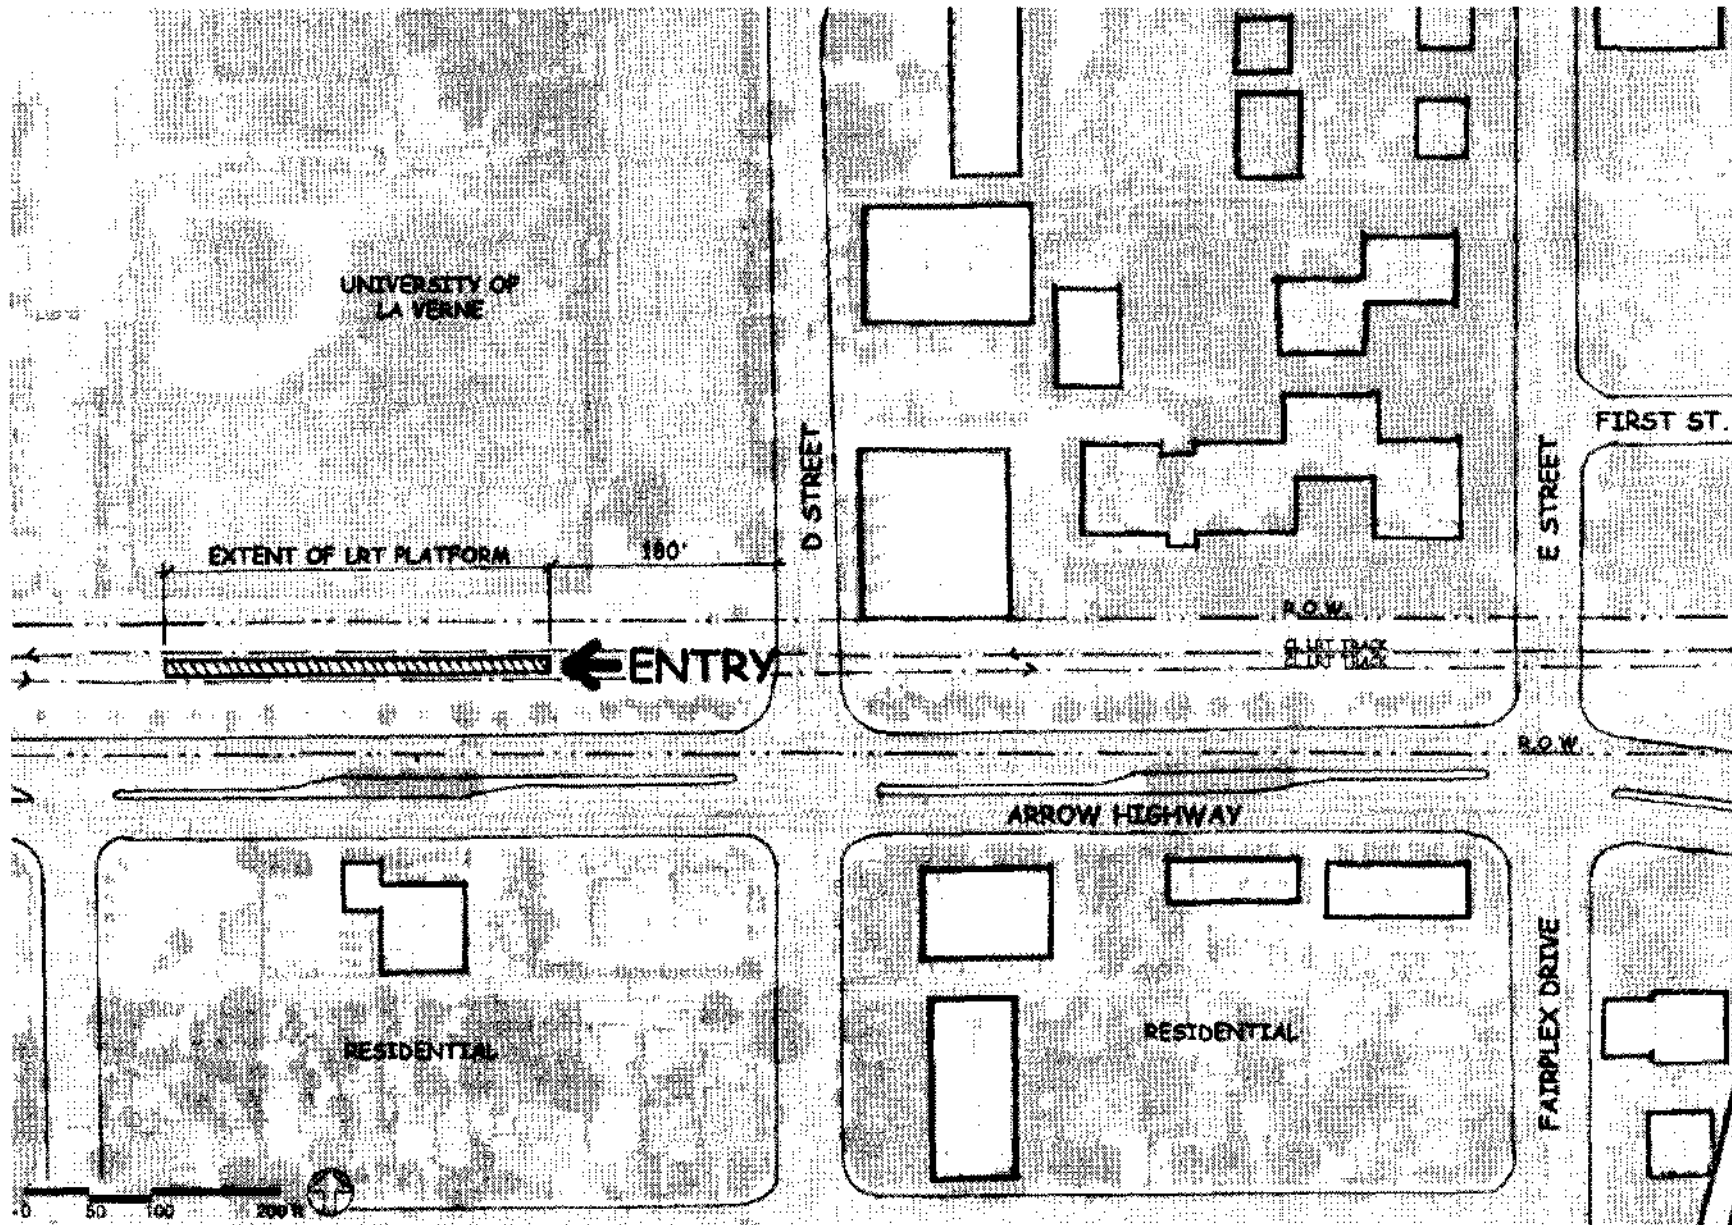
Site Plan: City of La Verne, D Street Station Option C
